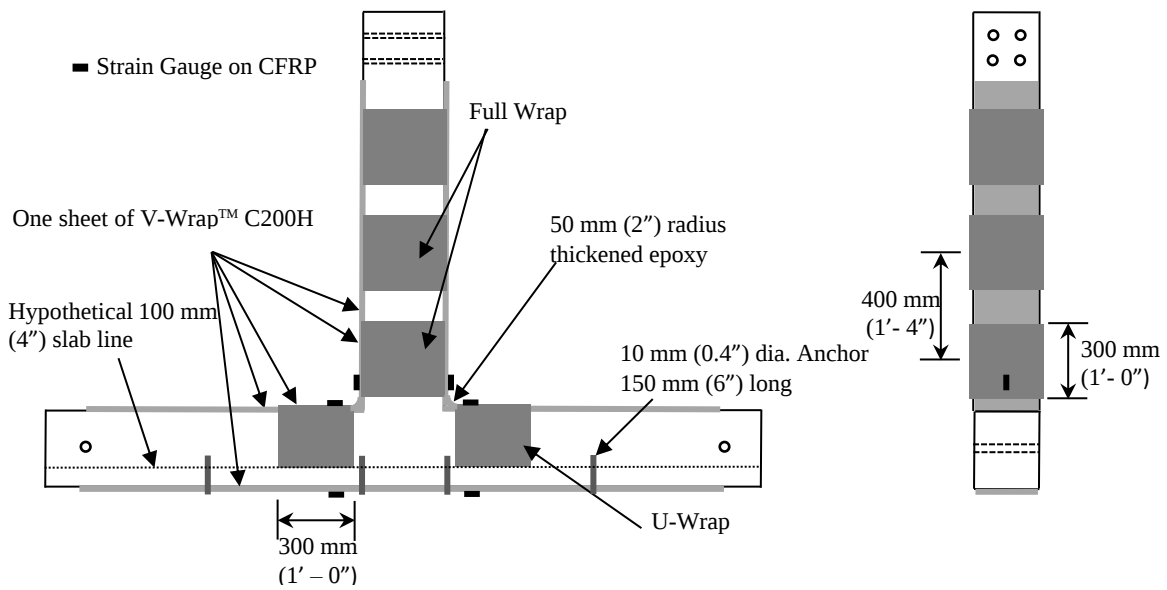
Strengthening Details and Strain Gauge Locations for Specimen BCA-2 (Saqaan et al. 2020).
